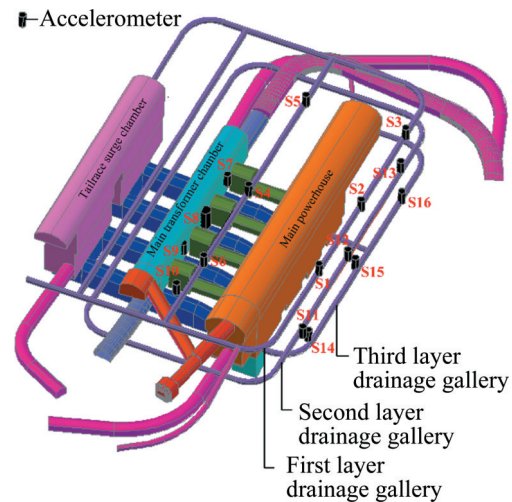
Spatial layout of accelerometers of Houziyan underground powerhouse caverns
